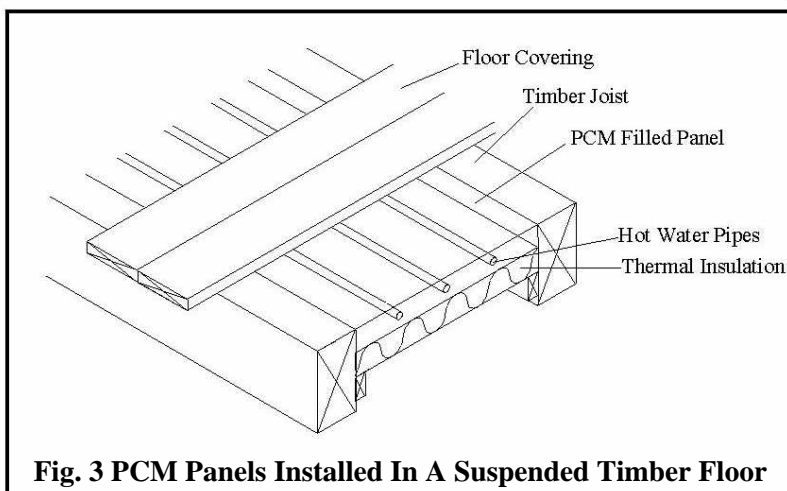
PCM Panels Installed In A Suspended Timber Floor
